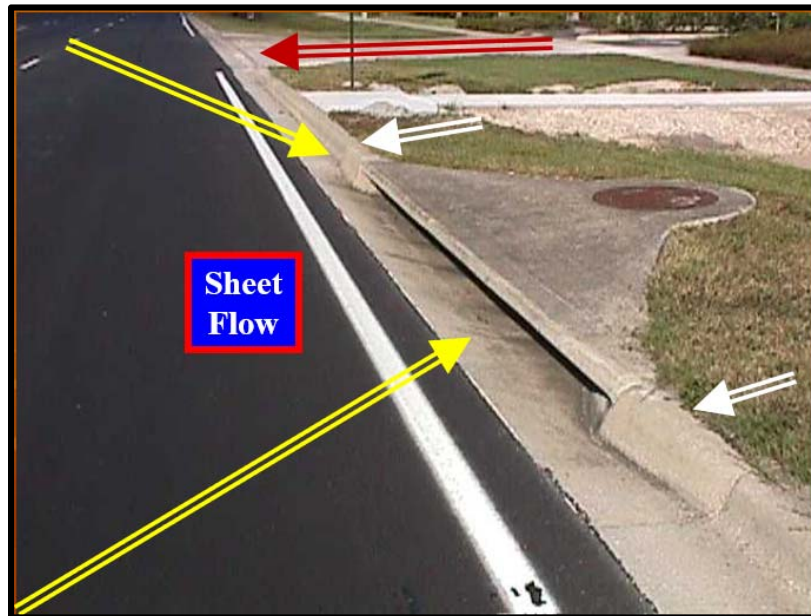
Sheet Flow from Centerline of a Road and Adjacent Property
